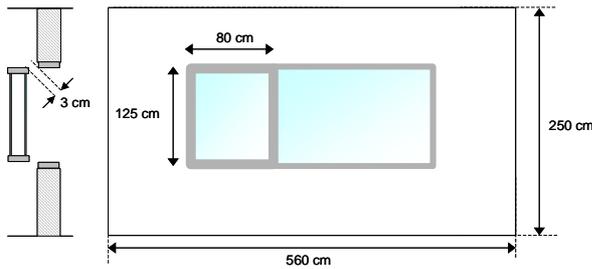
Cross section and front view of the façade with the parallel window, opening to the outside.
